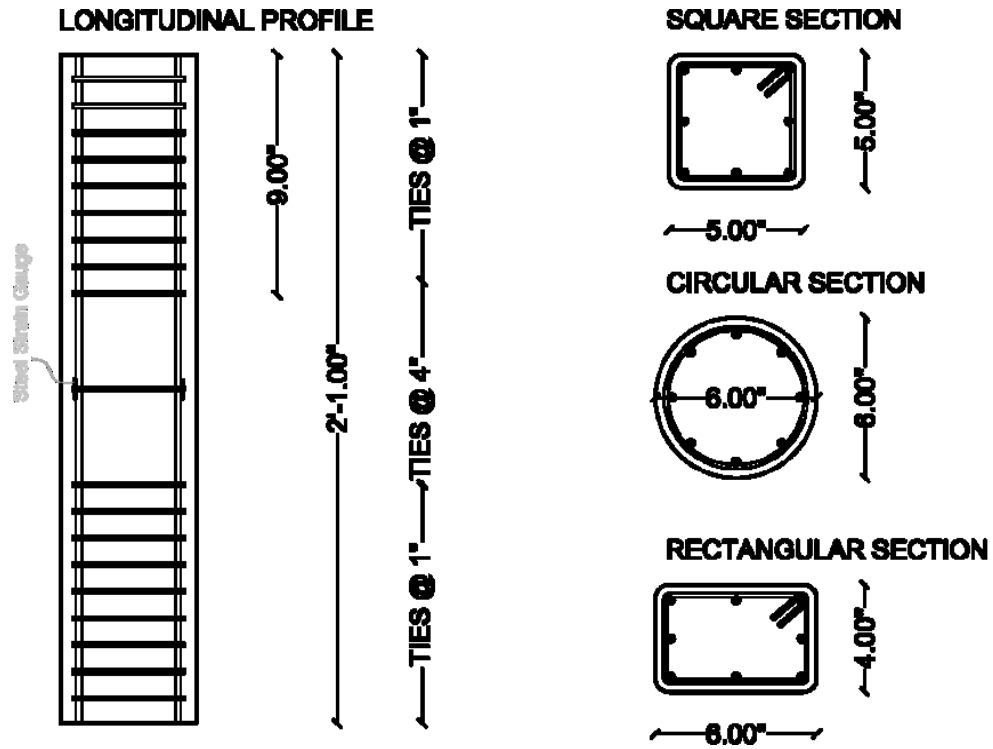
Reinforcement layout of small scale RC column specimens
